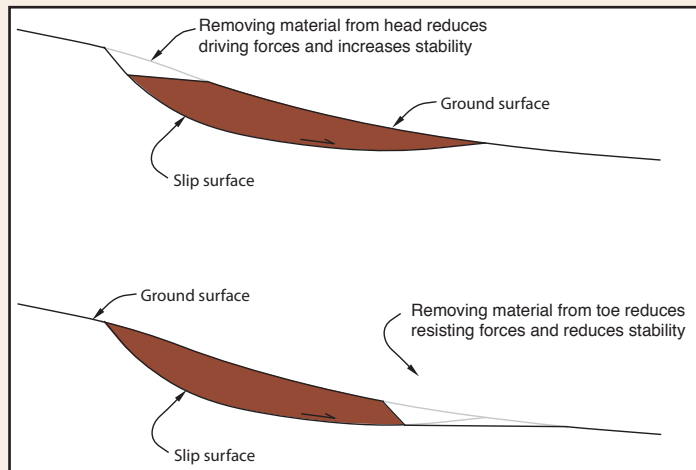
, C2, and C3 provide a cross-sectional view, in schematic form, of general principles for slope excavation, showing the effects and consequences of where on a slope the excavation takes place. These graphics are general in nature, and a geotechnical engineer or other professional should always be consulted if possible.
